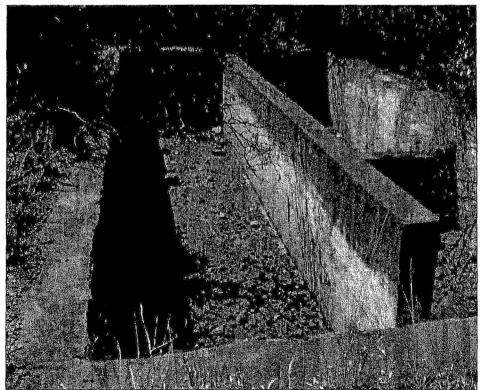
Concrete lined pit with dividing wall down the centre. Note water line on the wall.
